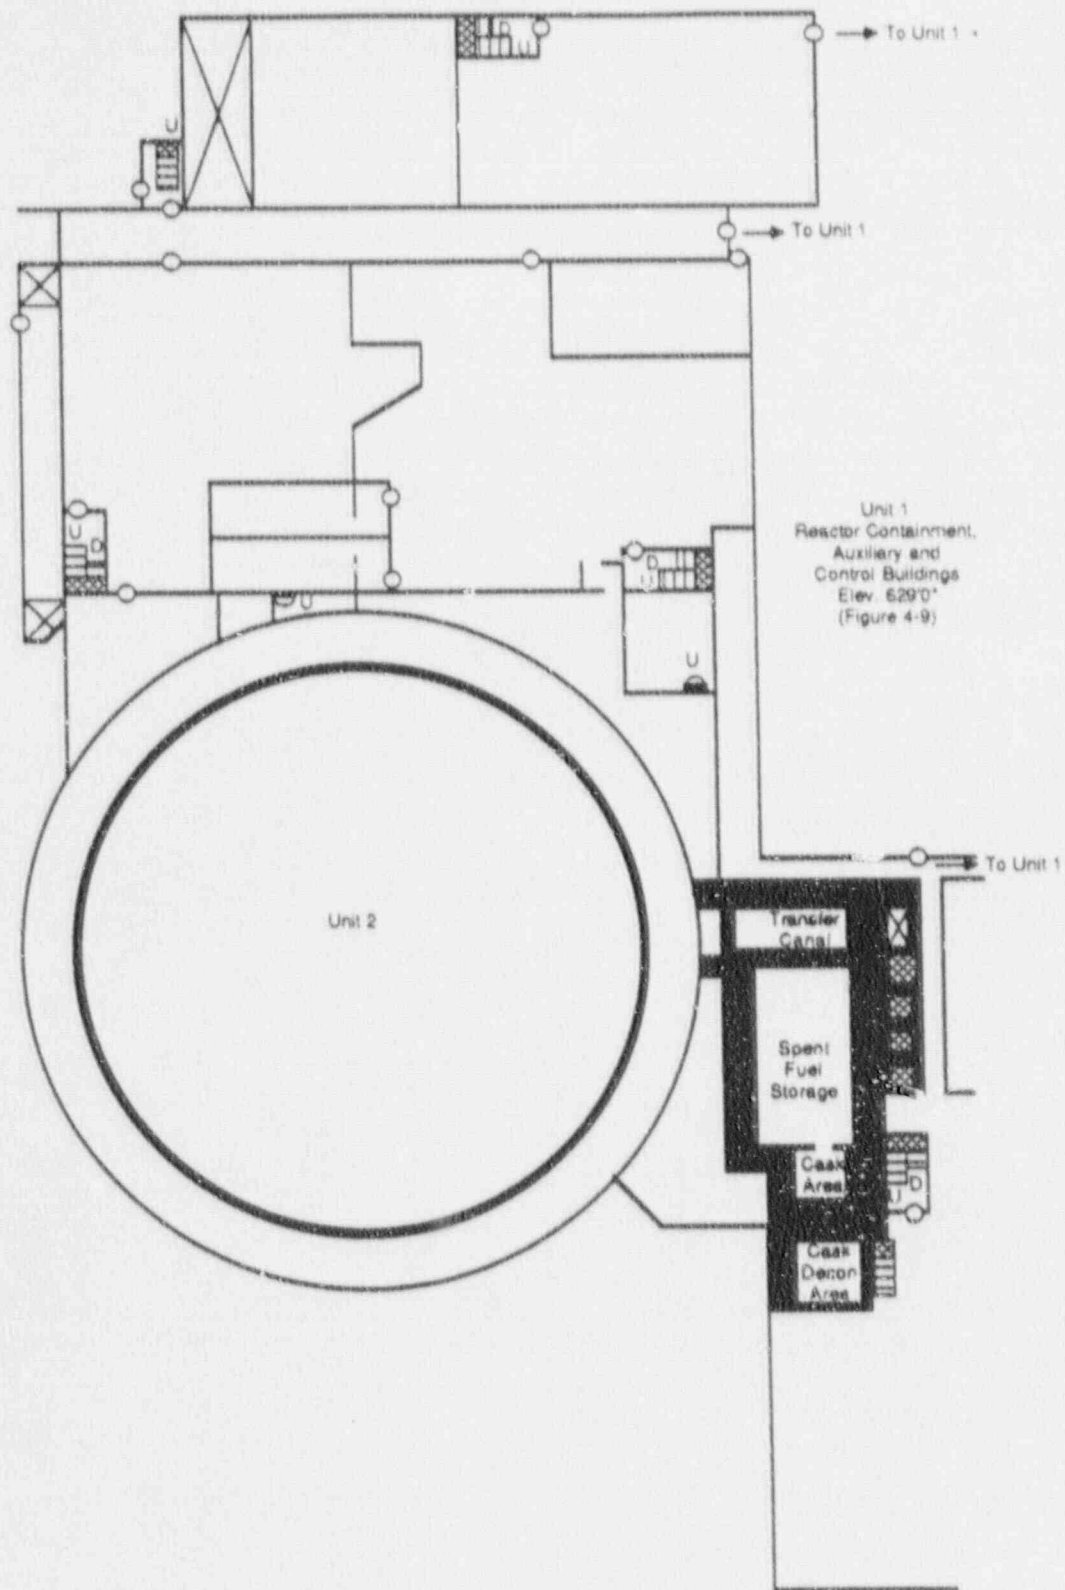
Bellefonte 2 Reactor Containment, Auxiliary and Control Buildings, Elevation 629'0"
